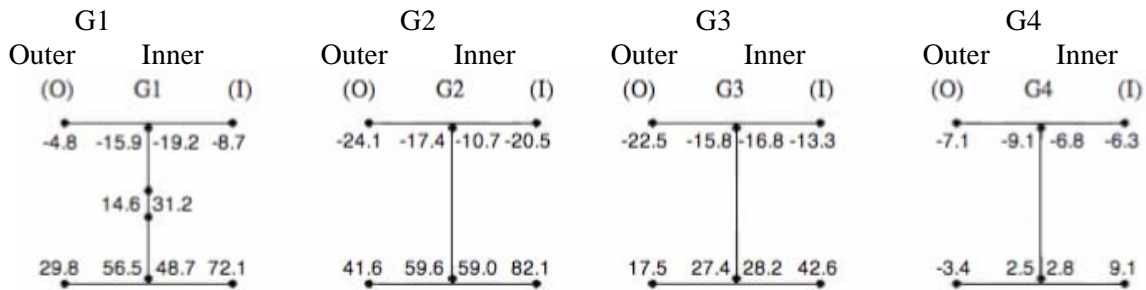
Girder Strains with Load at the Middle of the Main Span, Outside Run
